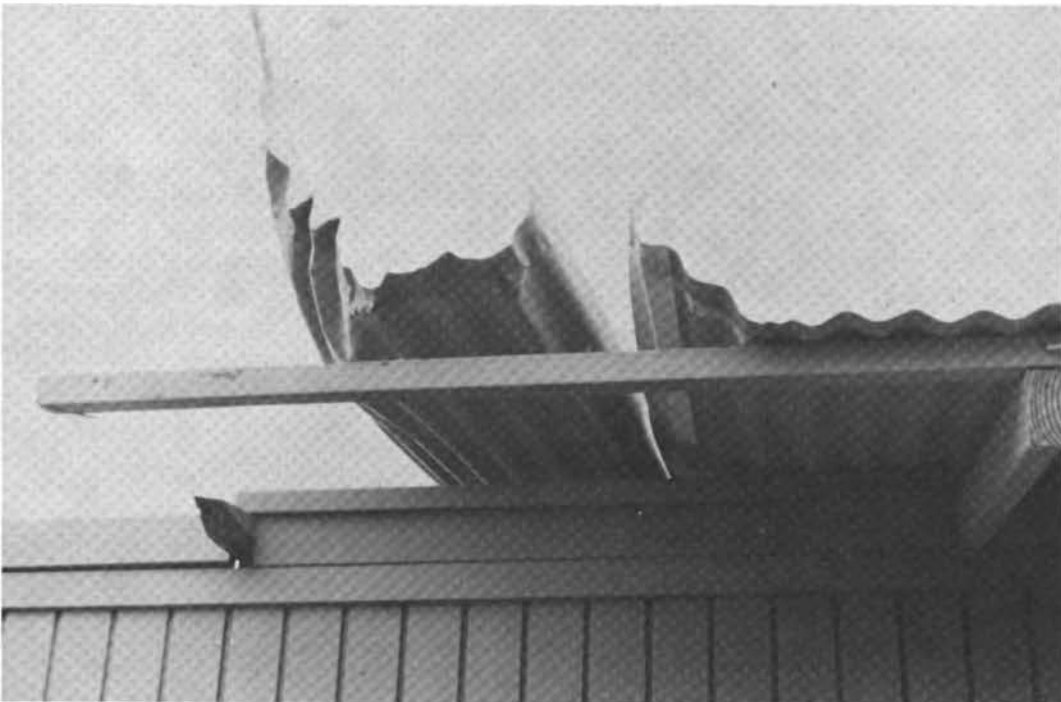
Light-gage corrugated metal sheeting used as roof covering.
